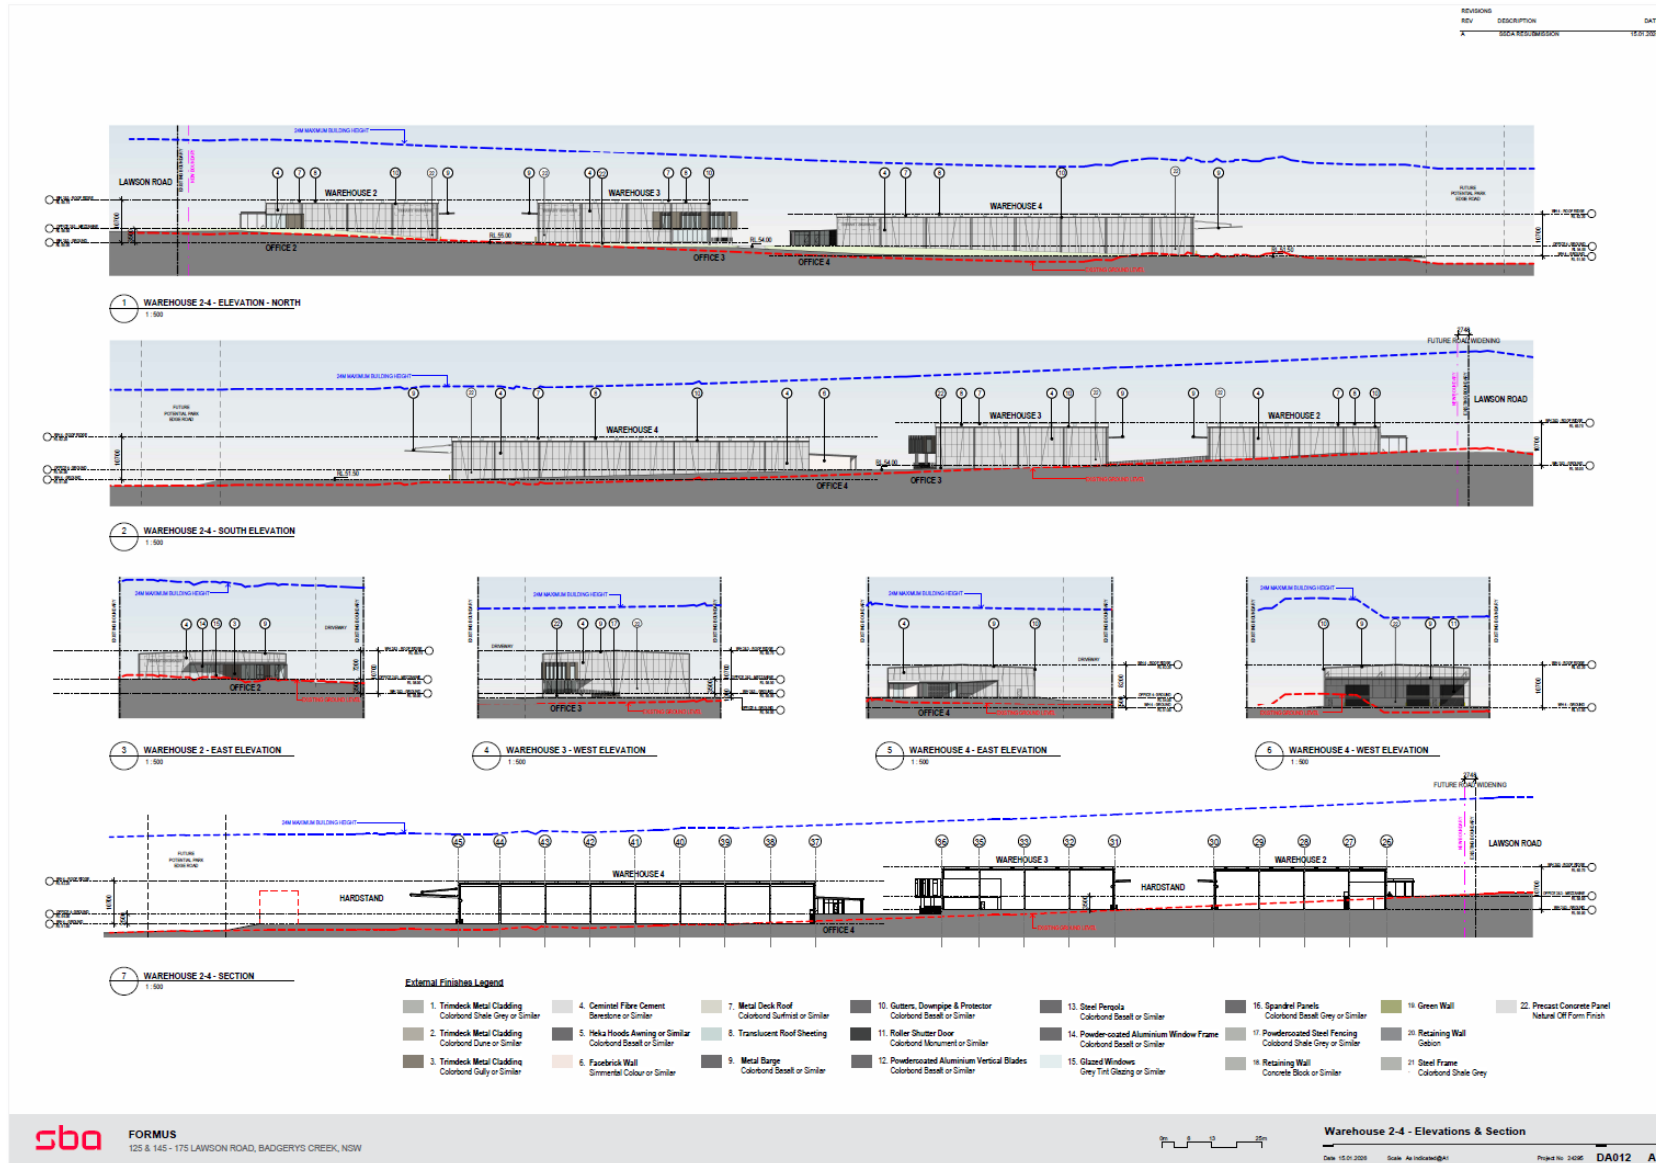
Extract of proposed architectural drawings, showing the elevations of Warehouse 2-4.
